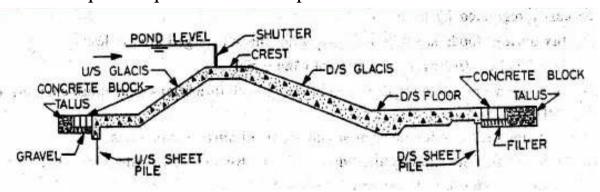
Typical cross section of concrete weir with downstream glacis on permeable foundation
